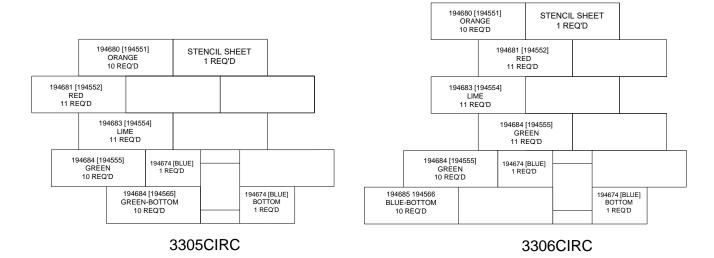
Wall Sheet Layouts — 30' CIRC Bins
